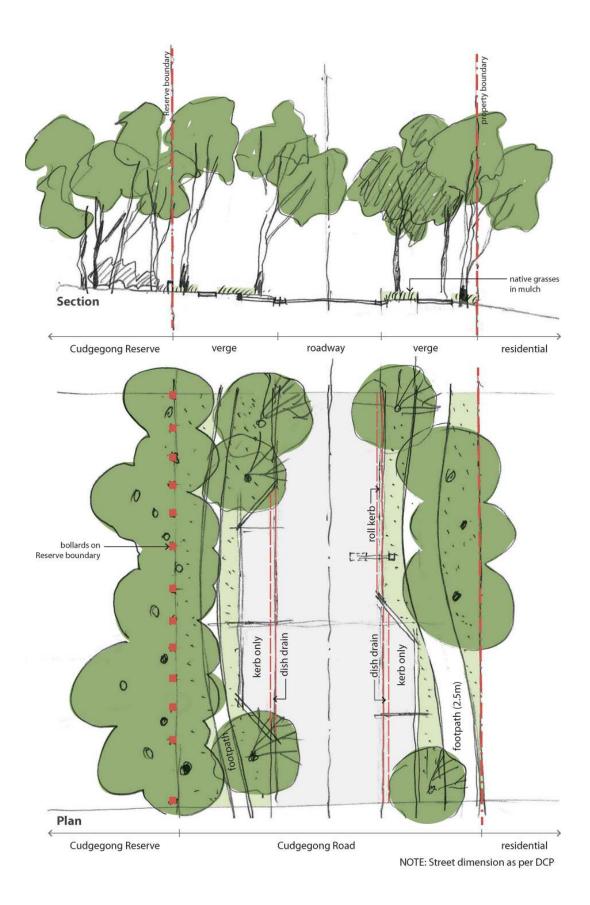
Cudgegong Reserve / Road Concept Plan and Section B
